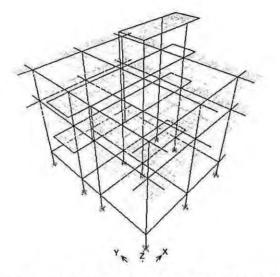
3D view of the FE model of a Type-D cyclone shelter (without bracing)
